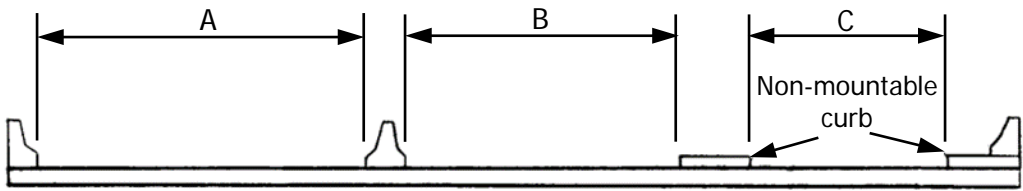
Cross-section view of a bridge deck with non-mountable curb and median barrier.
